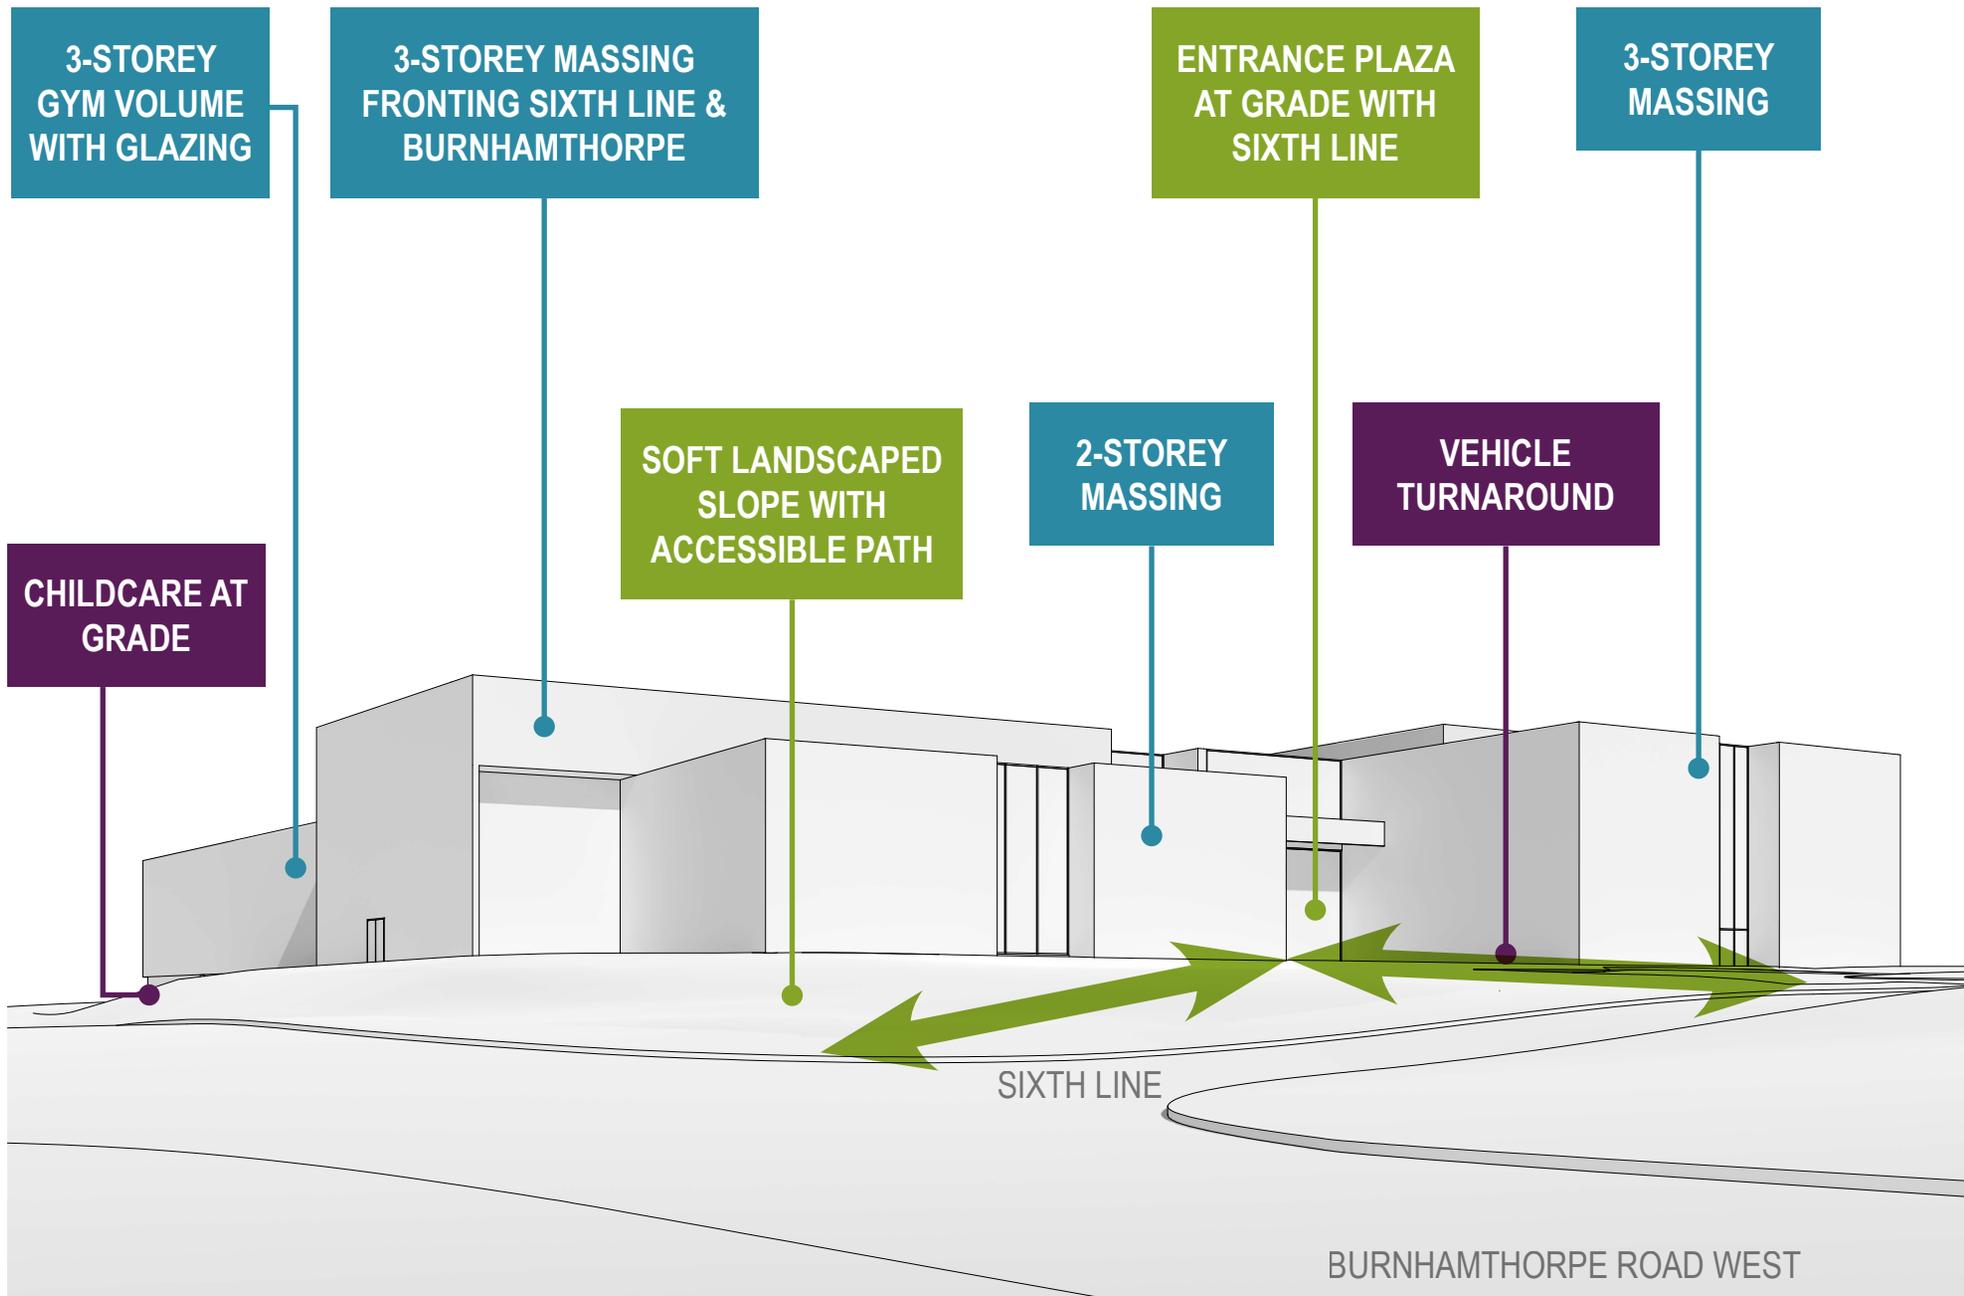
Massing view of the proposed school from the Sixth Line and Burnhamthorpe Road West intersection with topography
